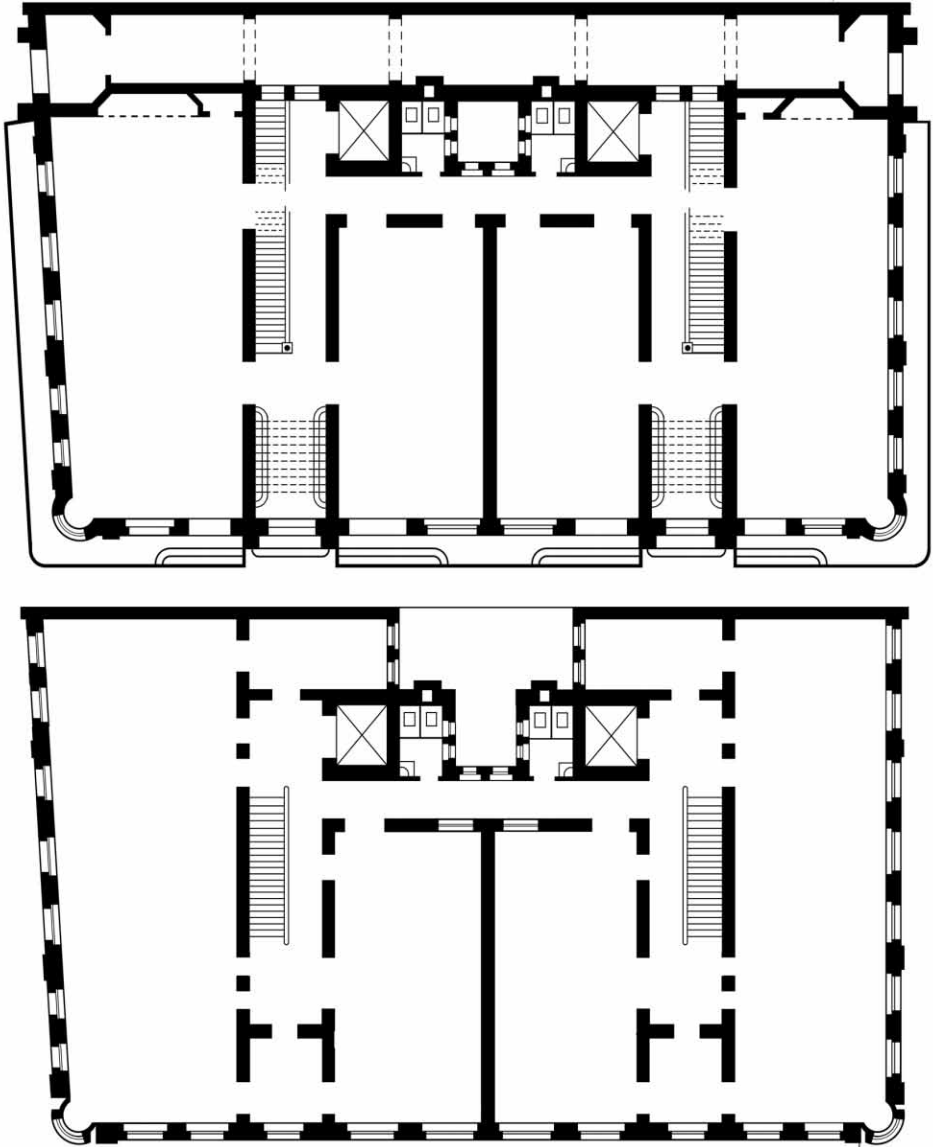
First and third floor plans, Bennett Building, New York City, 1873
